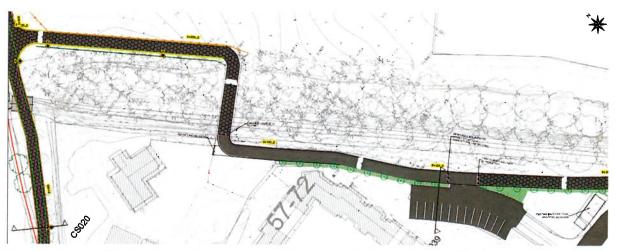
Proposed greenway section to the east of Kilmurray Village, the Horticulture building and University Road (CH300_C-CH677_C)
